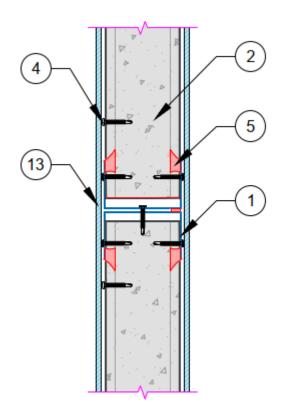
Back-to-back C-track connection in dual stack wall with 6 mm fibre cement lining
